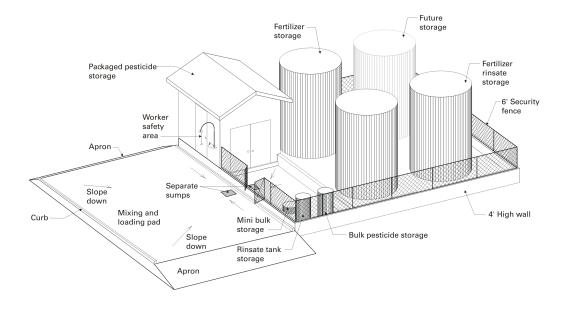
Medium-scale facility, perspective view. Optional roof over entire facility.
